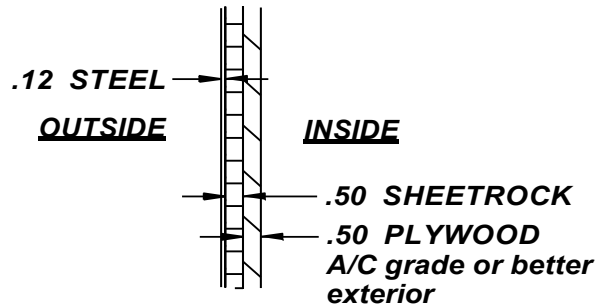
SLP-22 wall laminate shown with steel outer covering.
